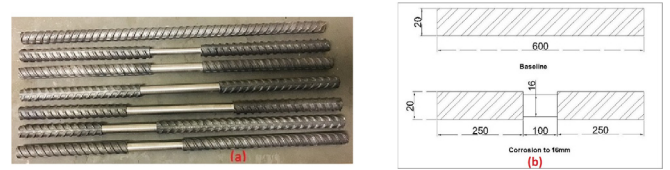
(a) Rebar samples used in the experiment and (b) a typical reinforcement bar used as a baseline, and a reinforcement bar with corrosion.
